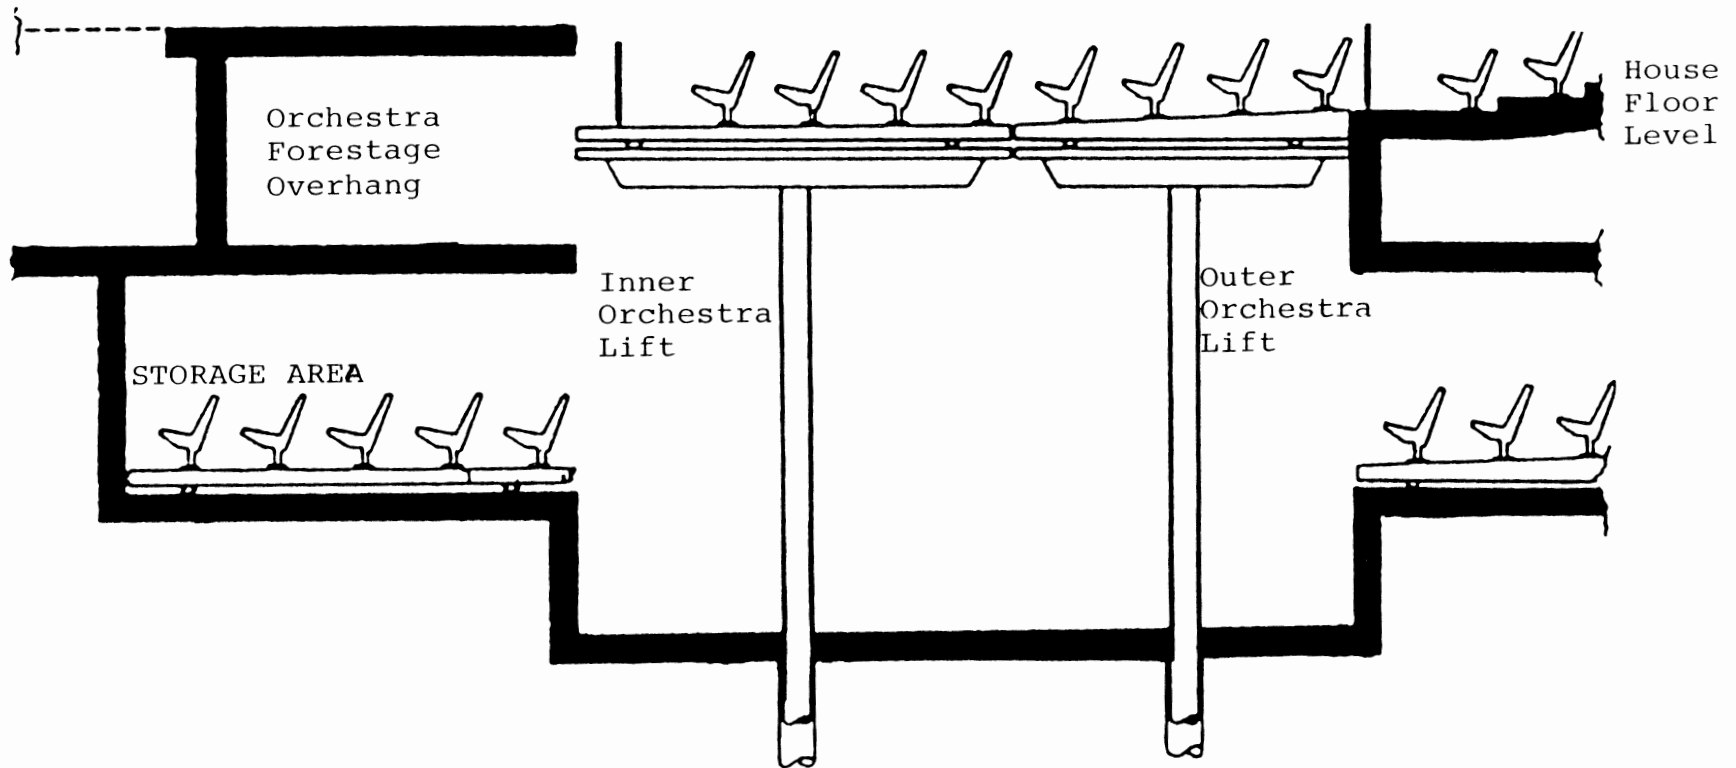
Storage areas beneath the auditorium and orchestra pit floors
